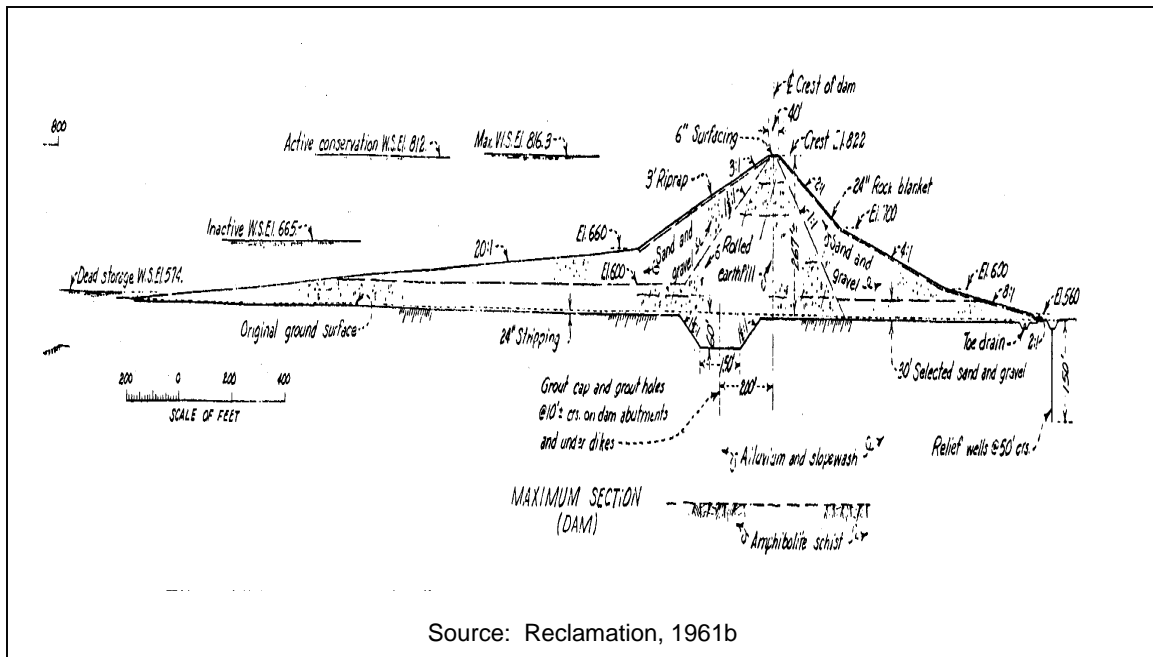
CROSS SECTION OF POTENTIAL HUNGRY HOLLOW DAM
